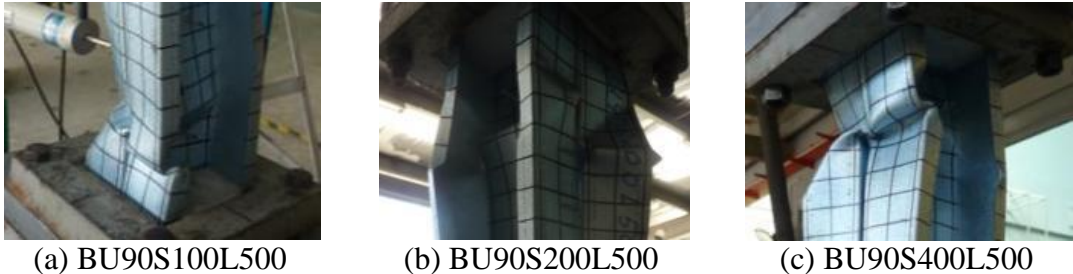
Failure Modes of Tested BU90L500 Built-up Columns
